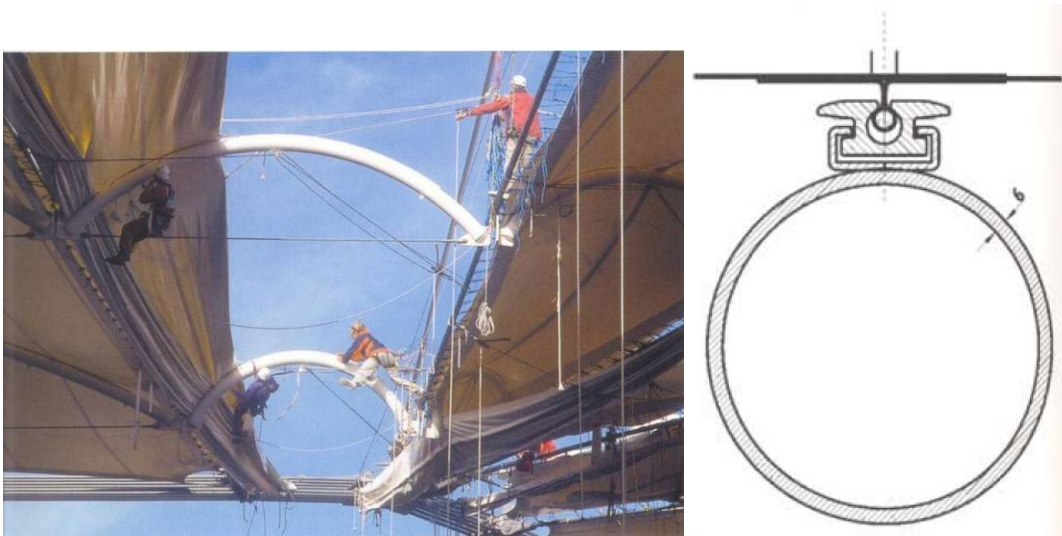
Clamping edge, planned details on RHS, LHS shows situation during installation with auxiliary clamps
